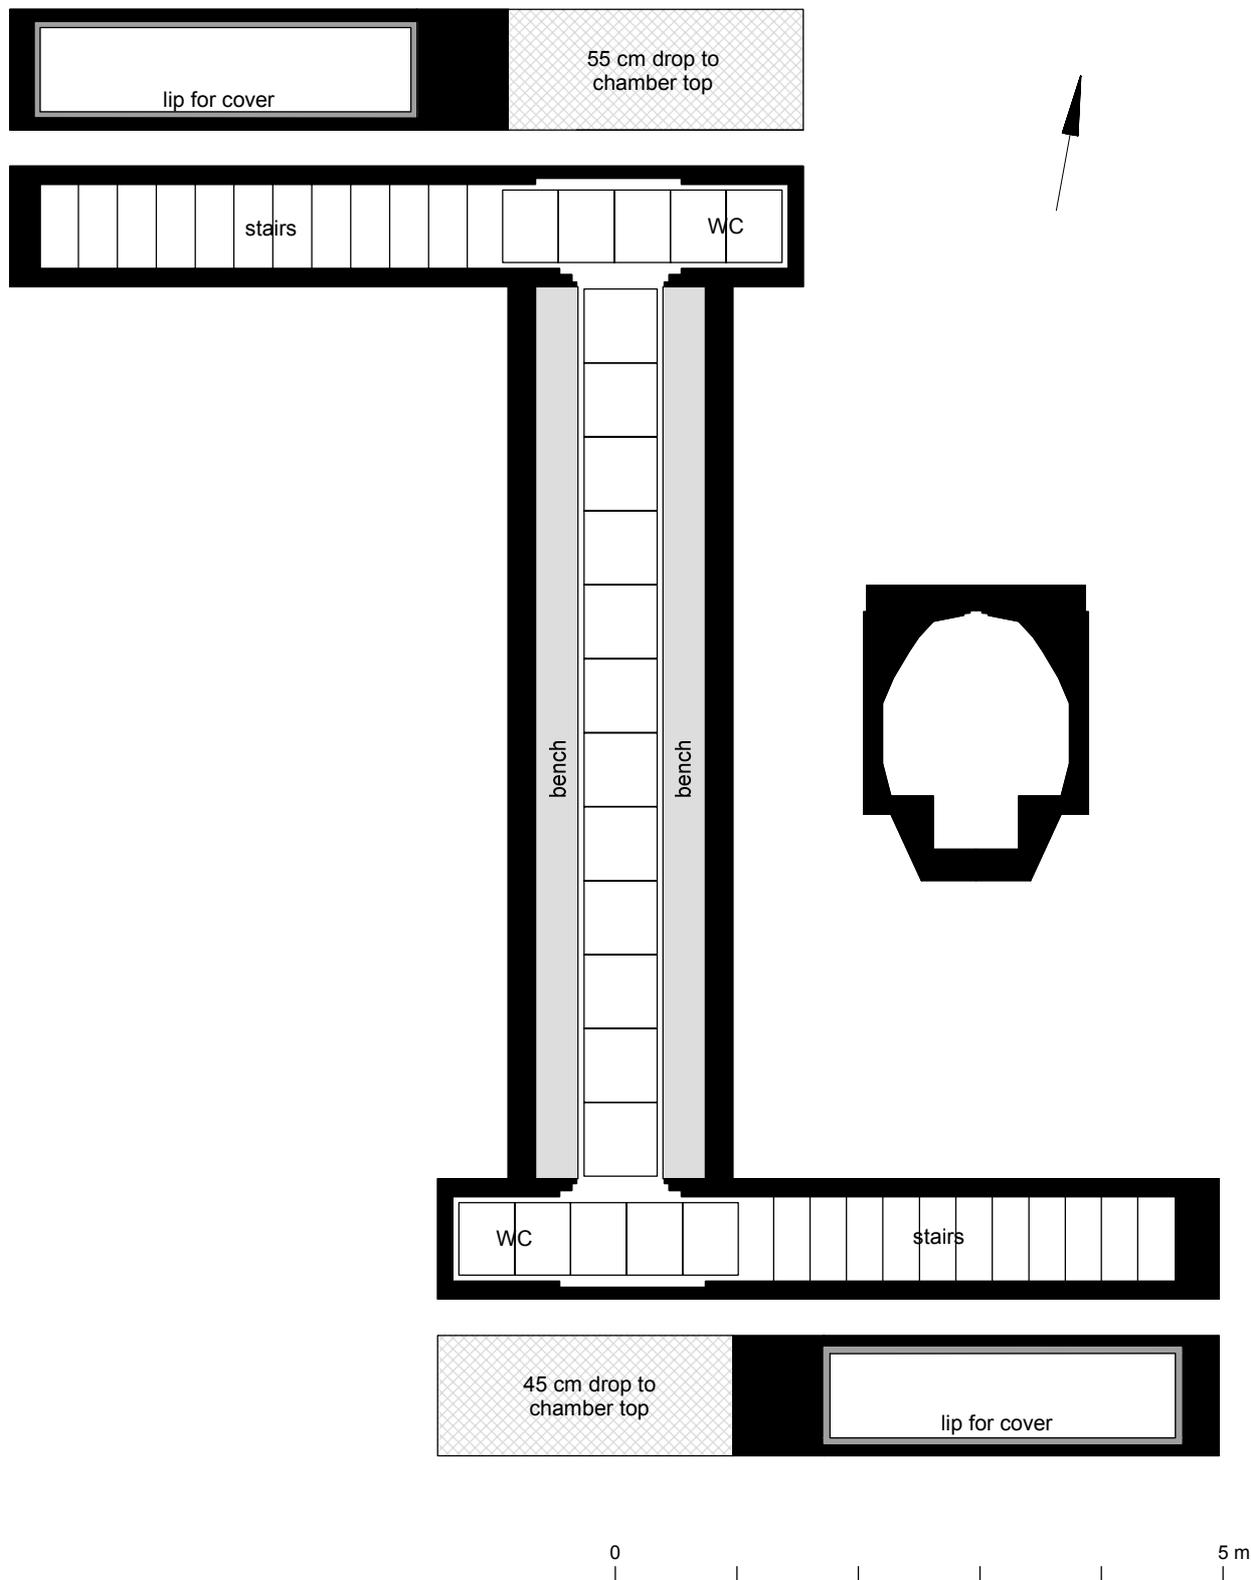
Area P1, air-raid shelter F1: internal plan and cross-section of chamber.
